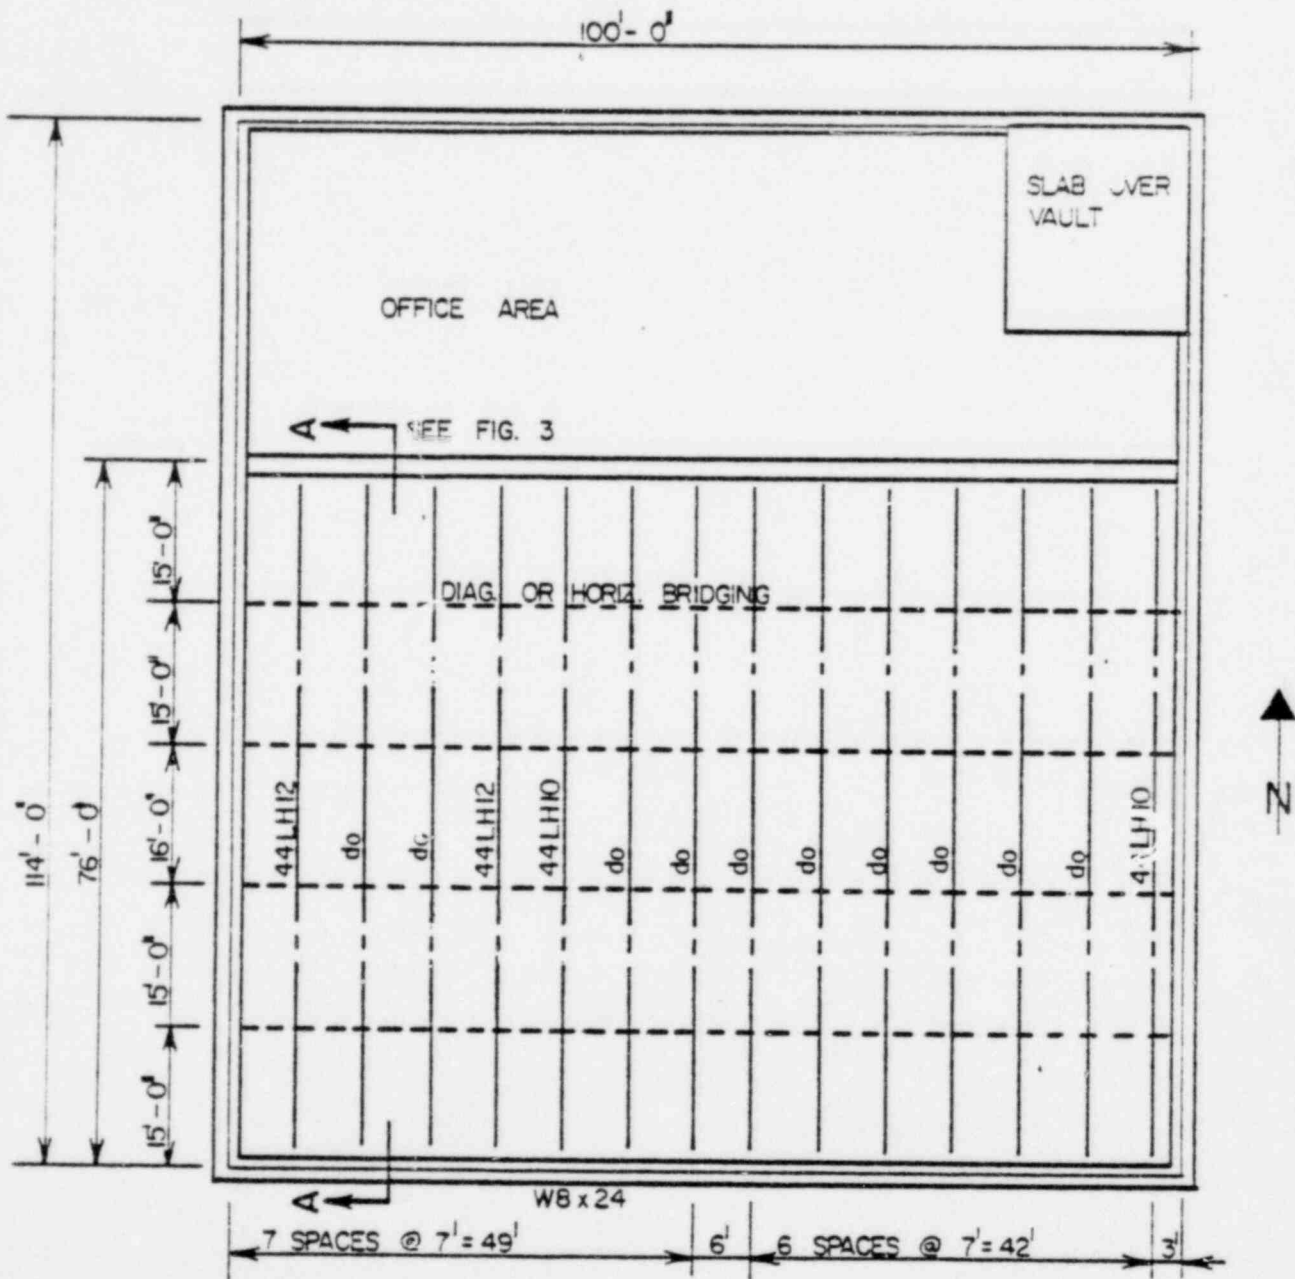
ROOF FRAMING PLAN OVER LAB AREA
